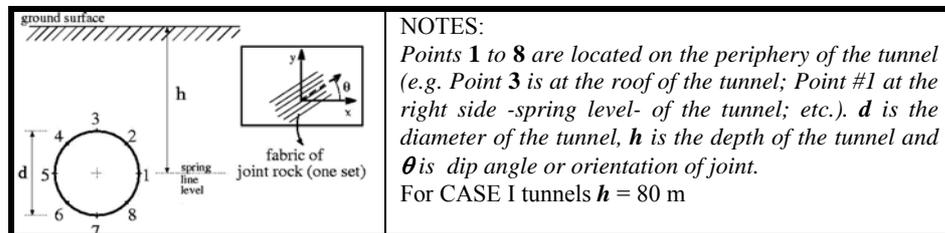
Tunnel Geometry and fabric of rock joint (inset)
